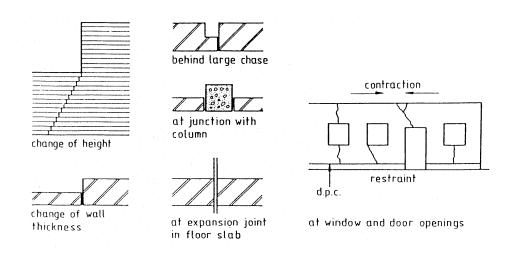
Preferred locations of masonry movement joints are located at zones in masonry veneer walls that are susceptible for crack formation [Beck & Curtin]
